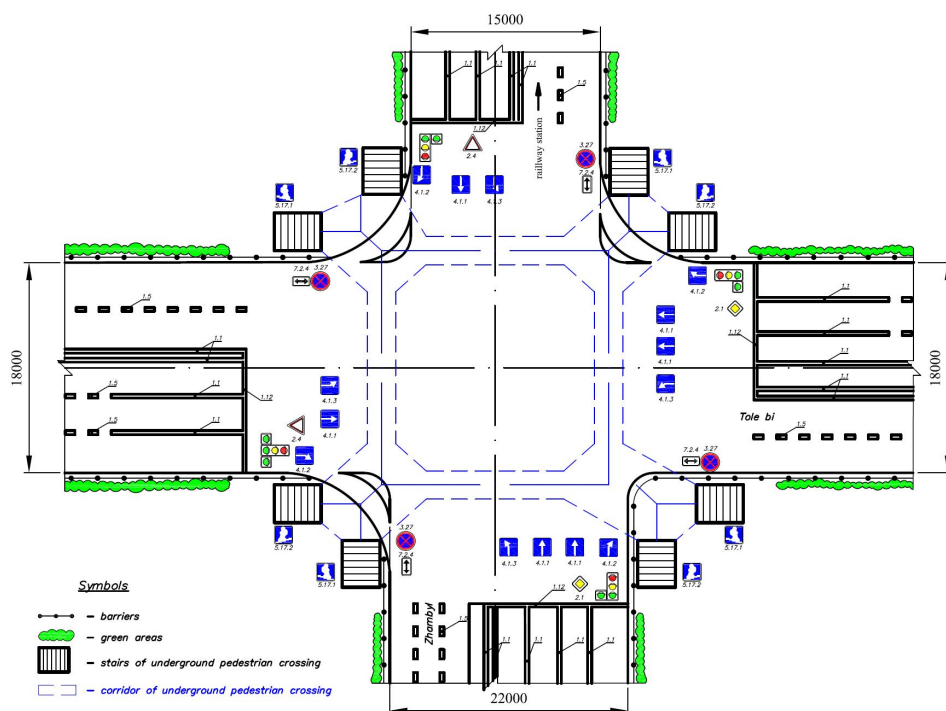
Arrangement of the viewed crossing with additional technical facilities of road traffic organization [9, 10]
